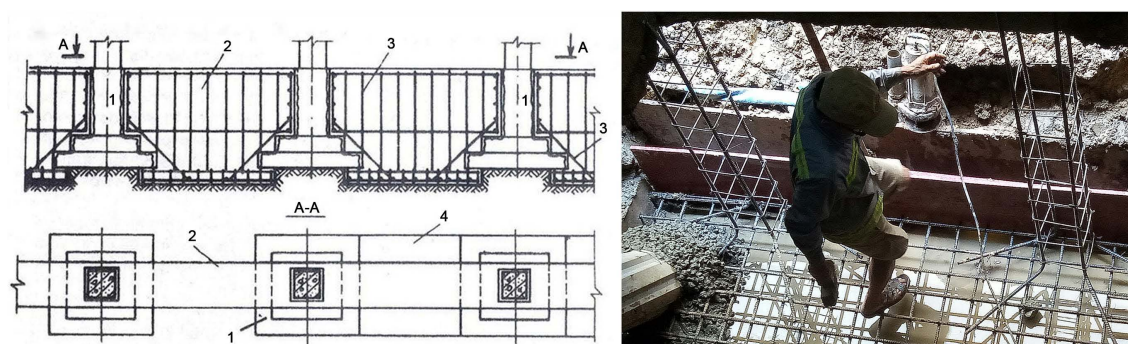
Reinforcement solution by switching foundation type. In Figure 6: 1—single foundation; 2—concrete wall; 3—bearing steel; 4—the area of the foundation is enlarged.
